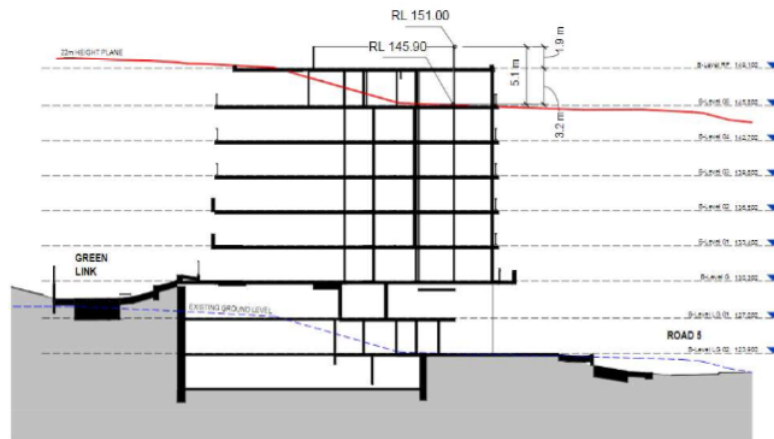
South Section of Building B showing the extent of height contravention (5.1m) (Source: Mirvac Design)
